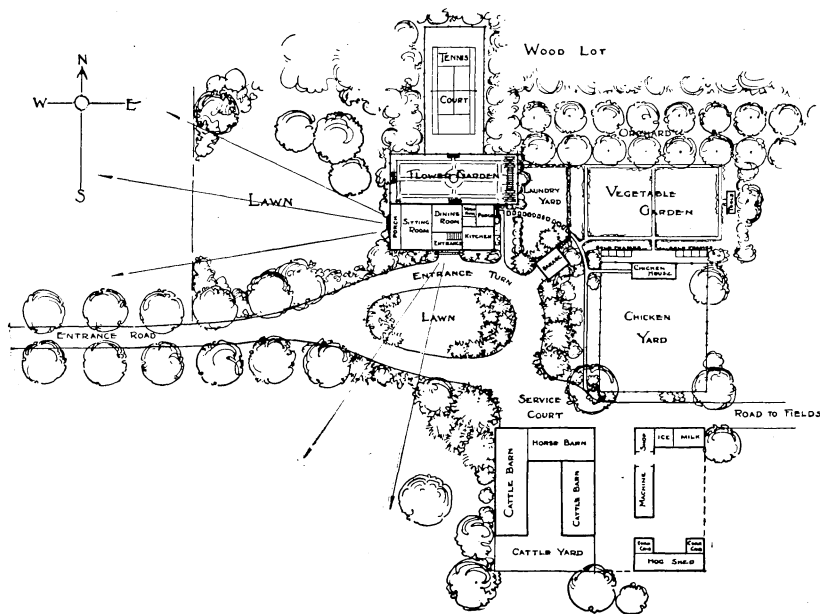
A plan for a farmstead where the buildings are back from a north-and-south road.
